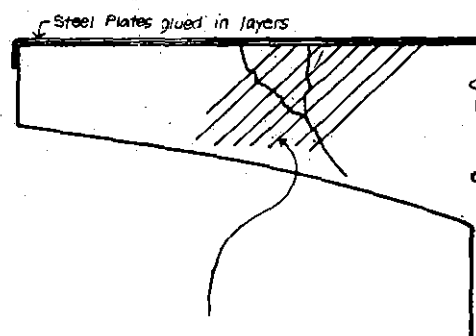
Added reinforcement installed to strengthen repair. Holes are drilled at right angles to the crack then filled with epoxy before bars are inserted.
